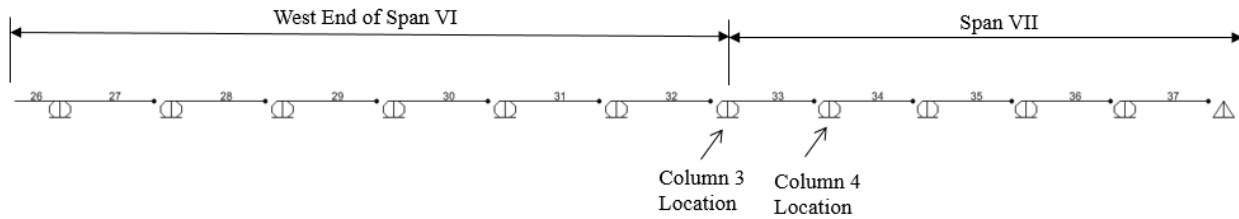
Span VII Longitudinal Beam Model (SAP 2013)
